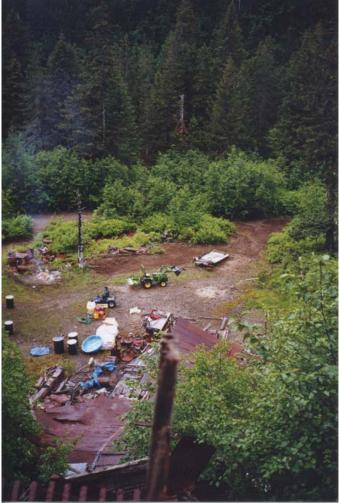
Beauty Bay Mine site looking northeast following the removal of tailings from Ponds C and G.
